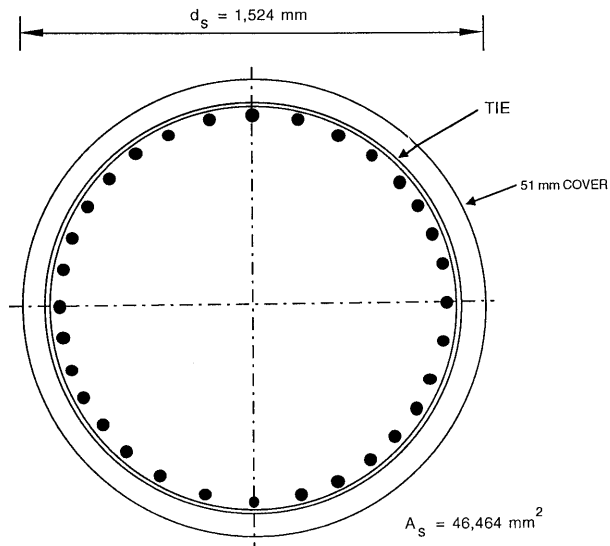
Cross section and reinforcement details of circular column used in parametric study
